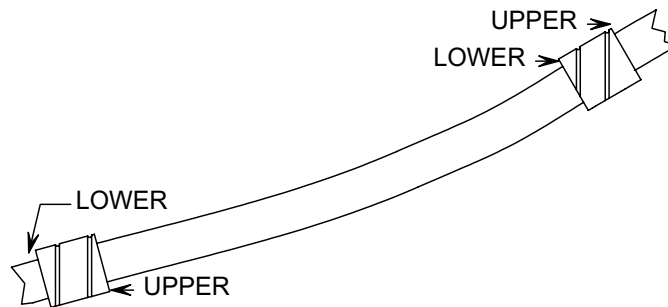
Cable Section Showing Top and Bottom Cable Bands On a Suspension Bridge
